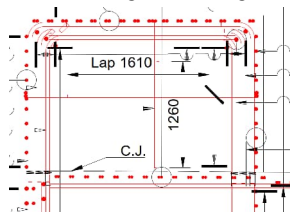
Shear key reinforcement, showing construction joint (C.J.) and couplers
